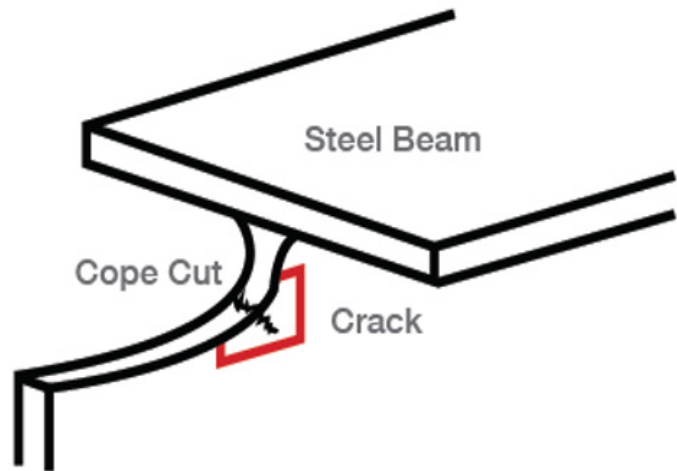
COPE CRACKS IN STRUCTURAL STEEL BEAMS AFTER GALVANIZING
